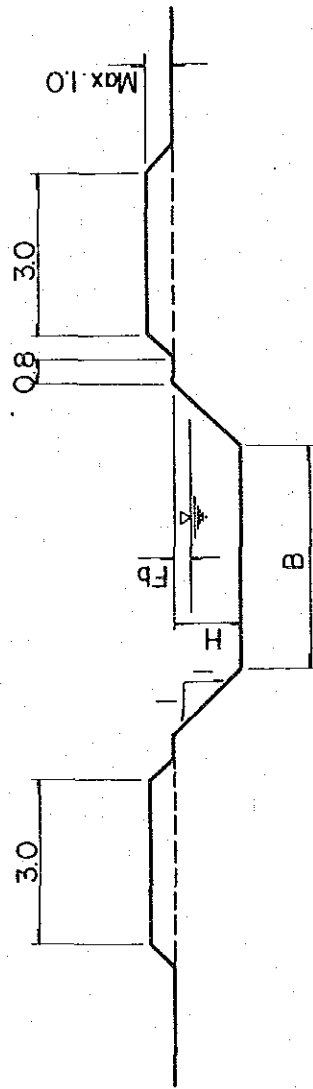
3 - 18 Standard Cross-Section of Drainage Canal
